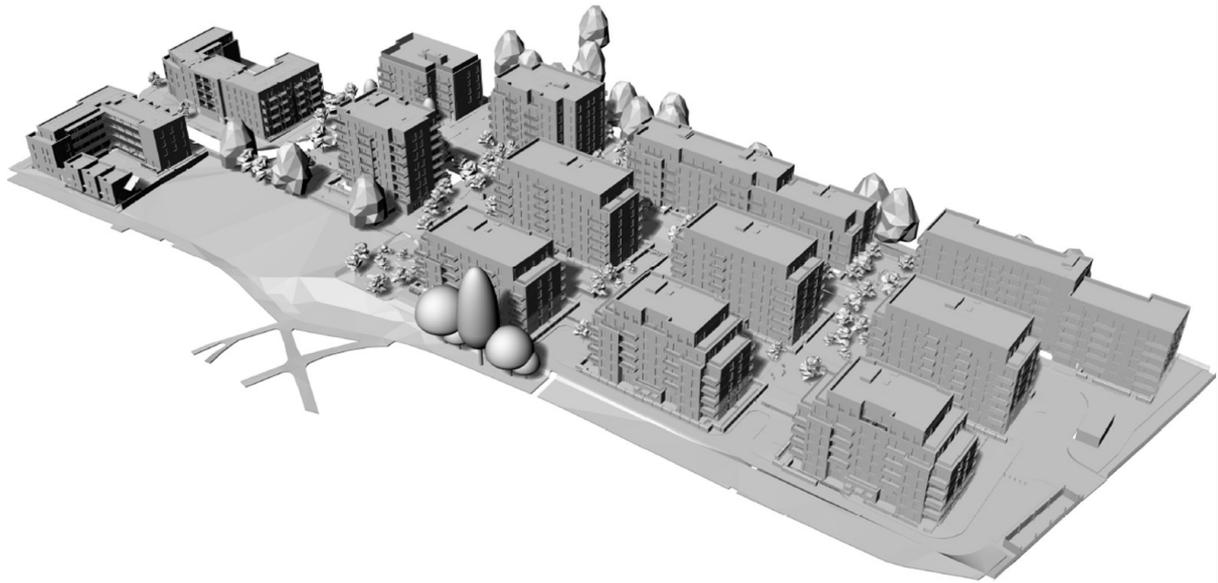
Proposed Siteplan and Landscaping Scheme
